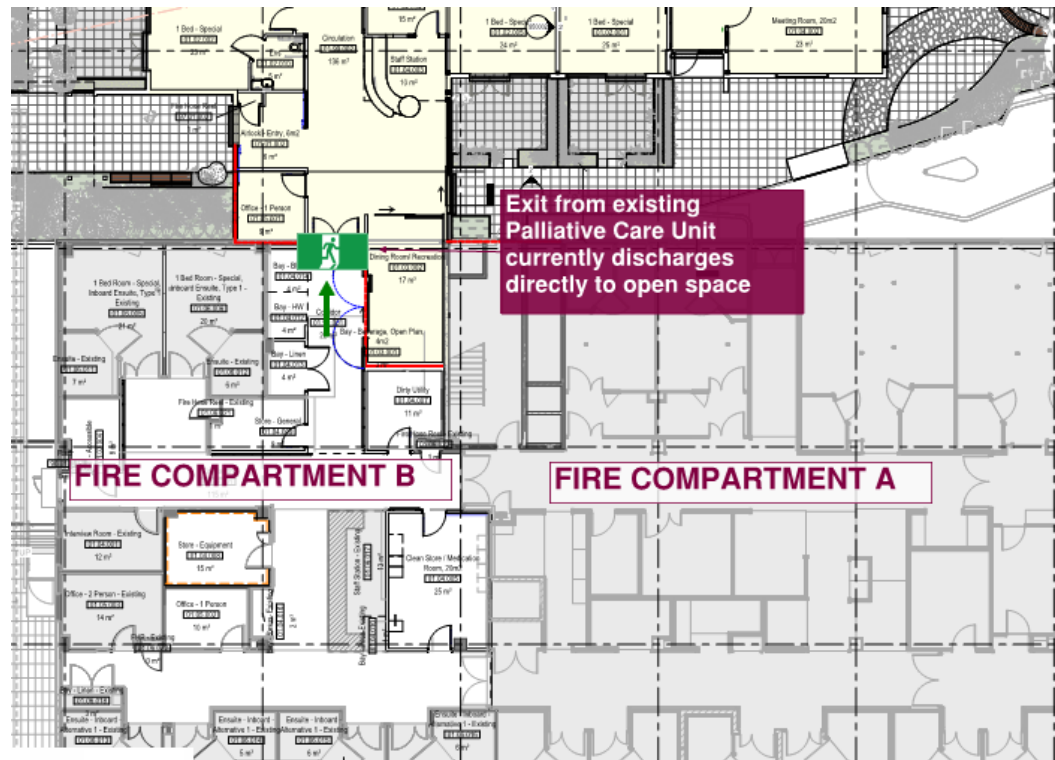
Current egress arrangement from the existing Palliative Care and adjoining Medical IPU
